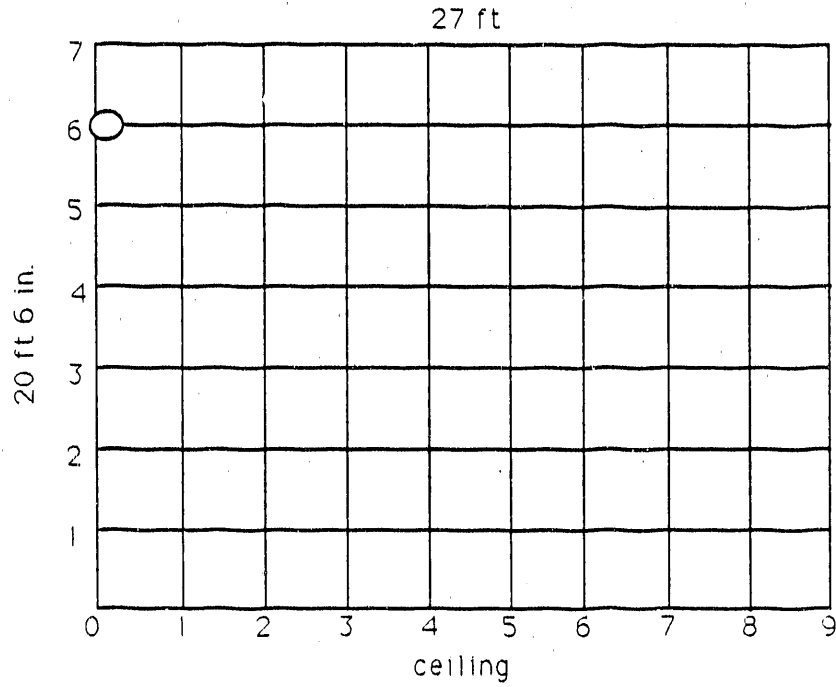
Area 1 Exhaust Fan Room Verification Concrete Core Samples. (sheet 2 of 3)
